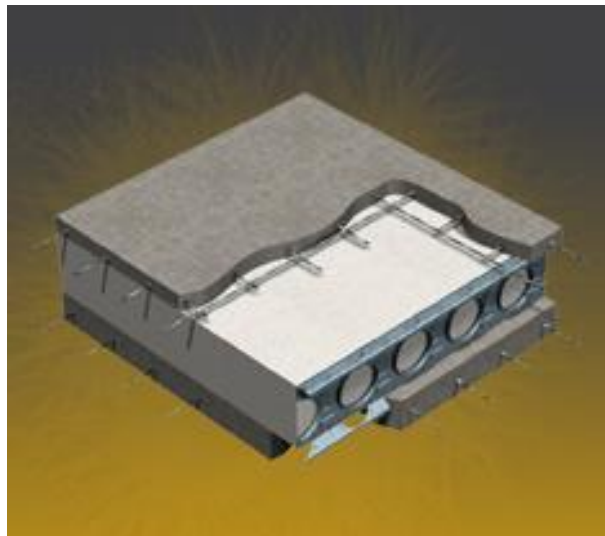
Thin concrete panel with internal and external reinforcement (“About@www.nexcon.ca” 2011)
